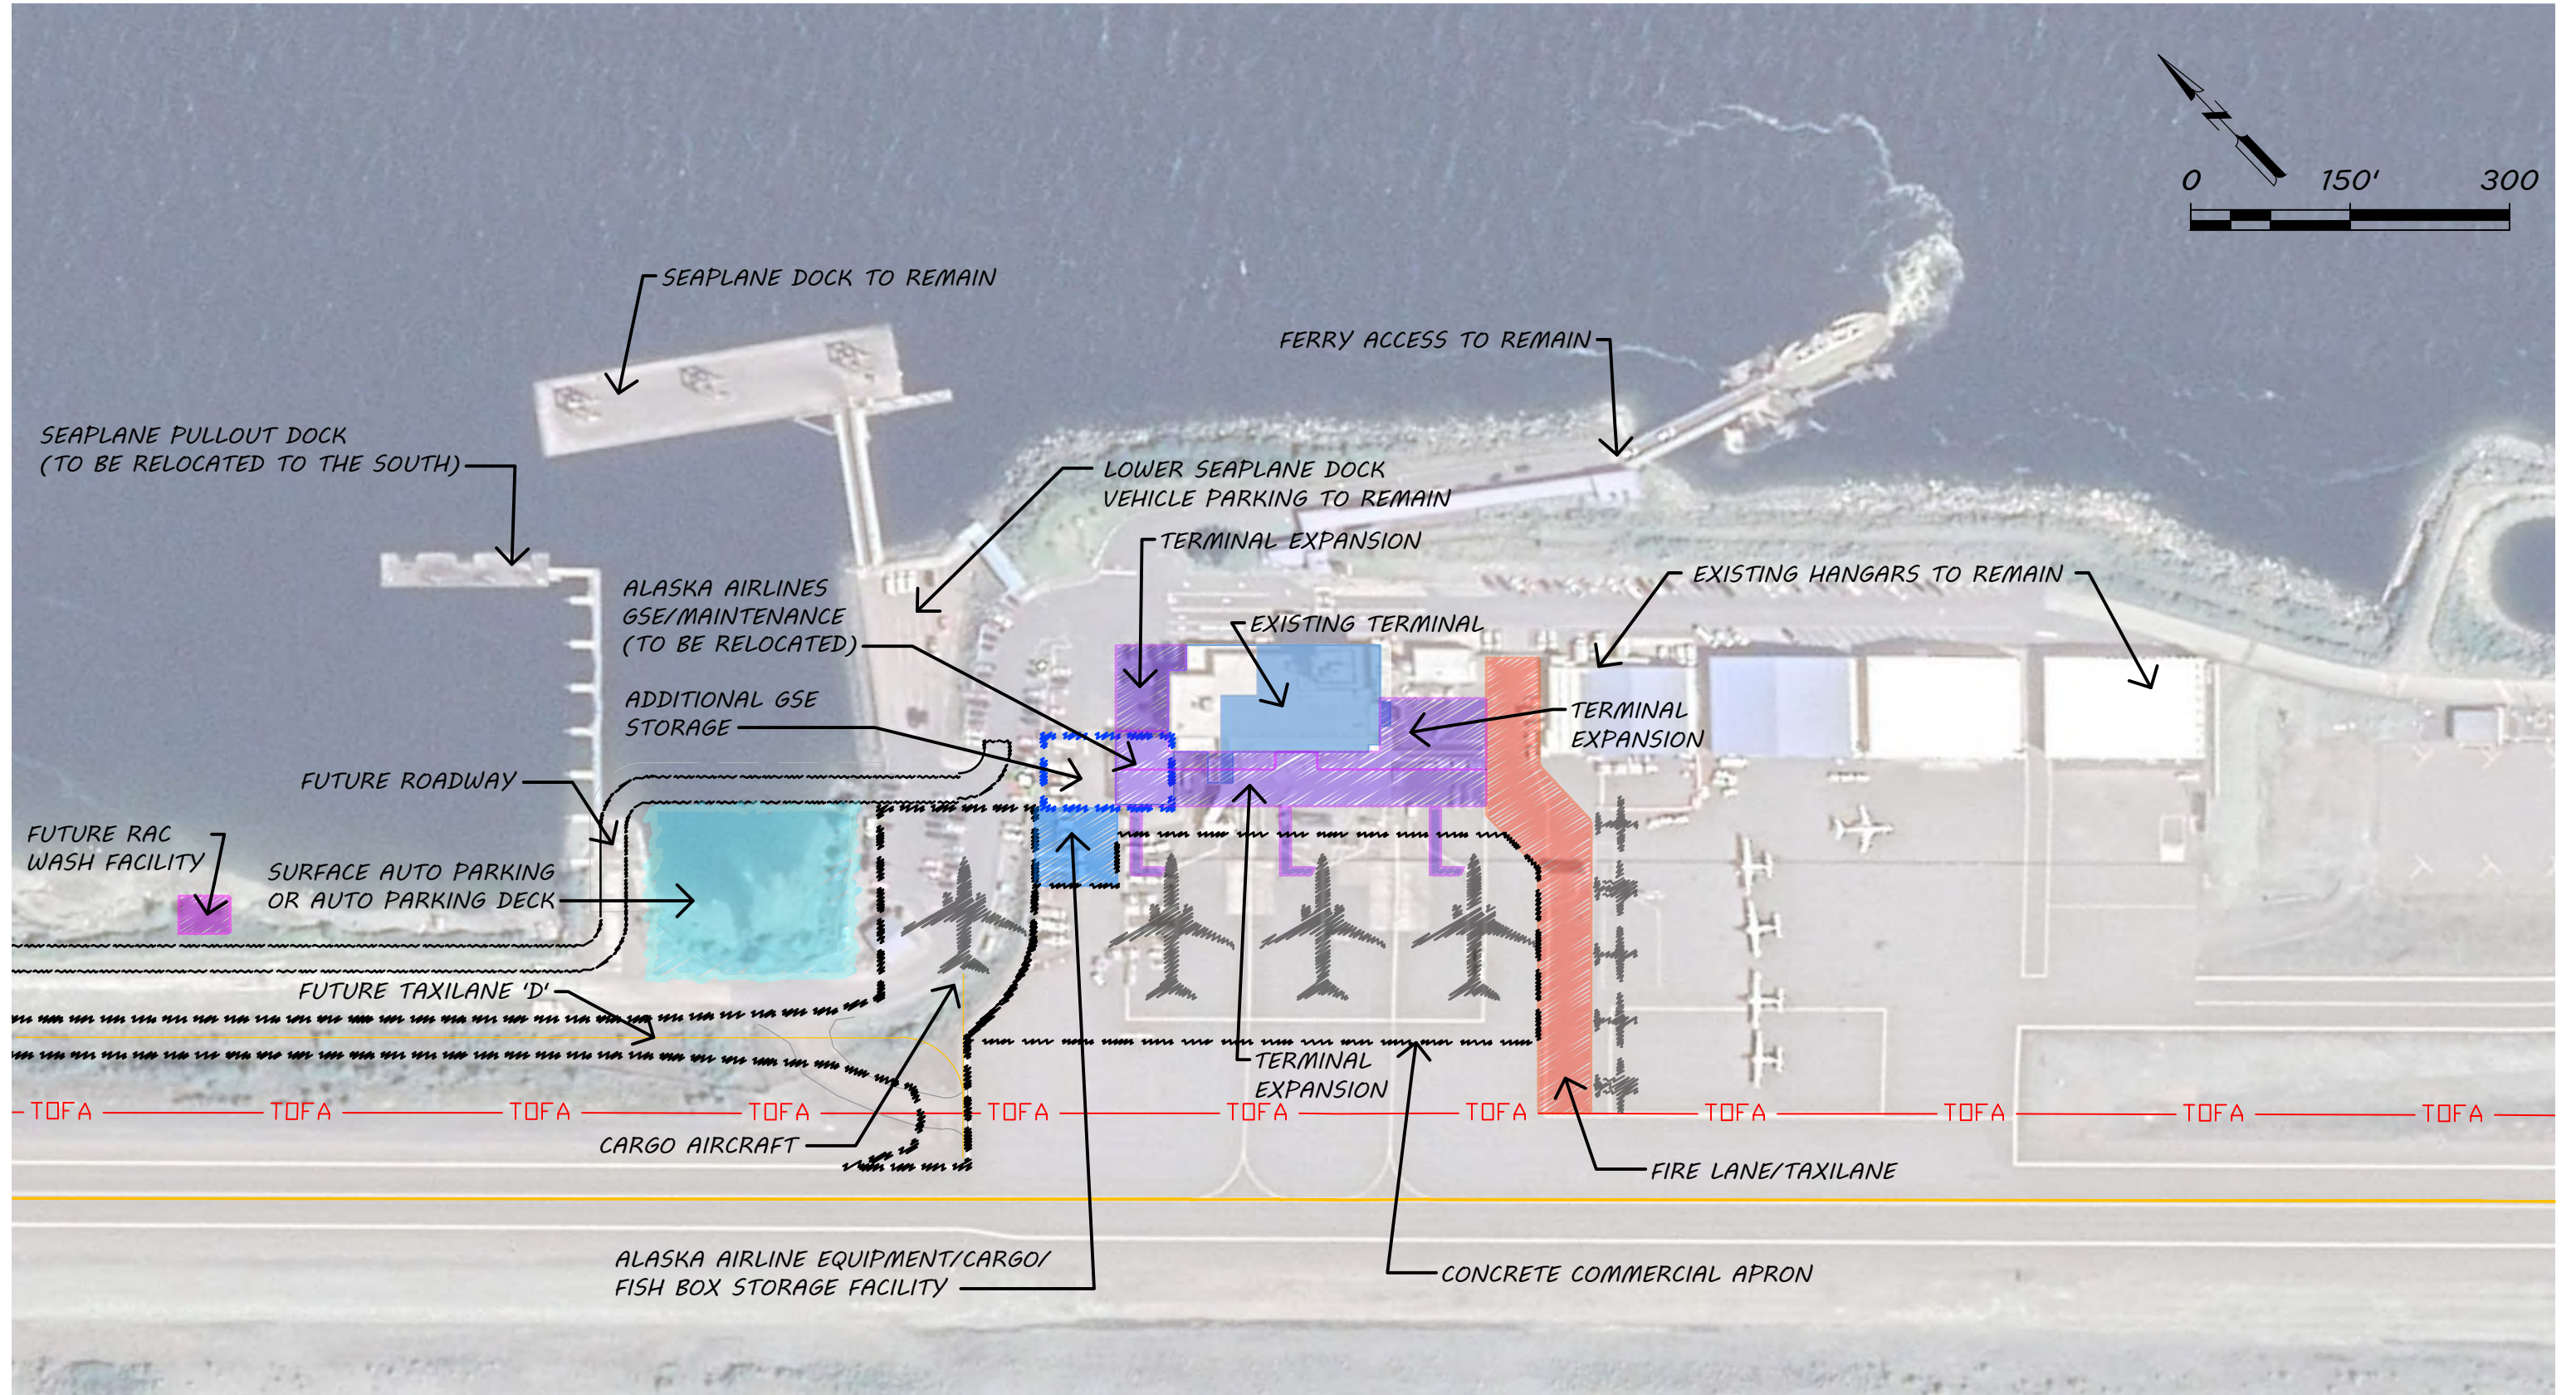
PRELIMINARY TERMINAL AREA CONCEPTUAL DEVELOPMENT PLAN
